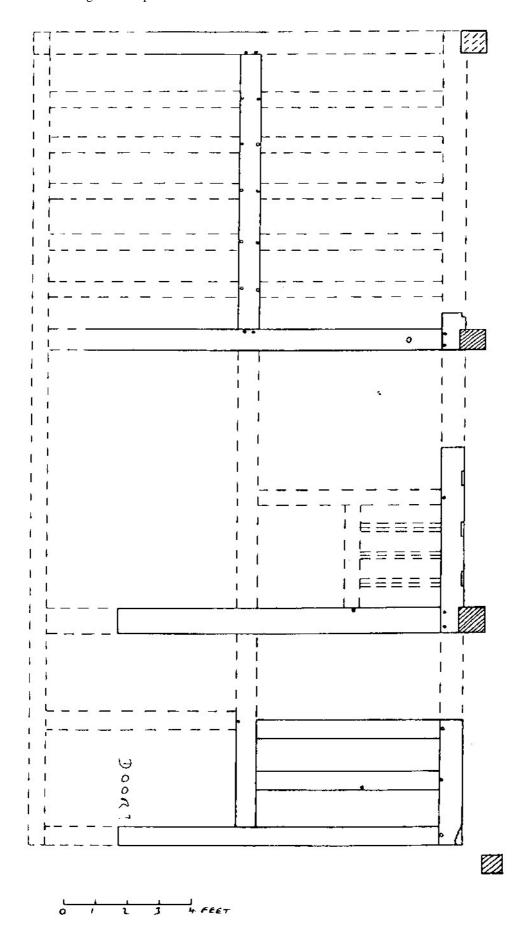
Mascott, Copford: Inline Hall and Bay, South Wall
